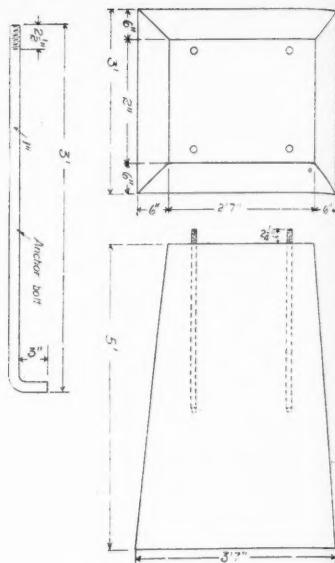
Concrete Signal Foundation. C. M. & St. P.
